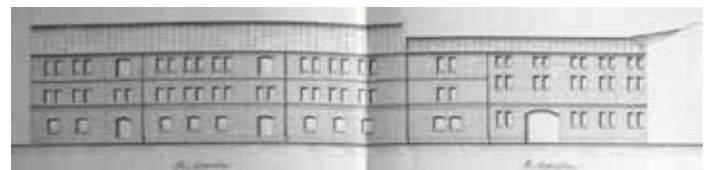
Project elevation of the ice-cellar’s extension and warehouse, 1904. Architect P. M. Bertschy. [2]
